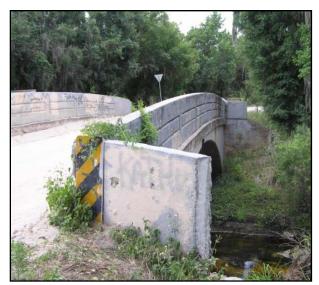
Payne Creek Bridge, Hardee County (No. 064069)
